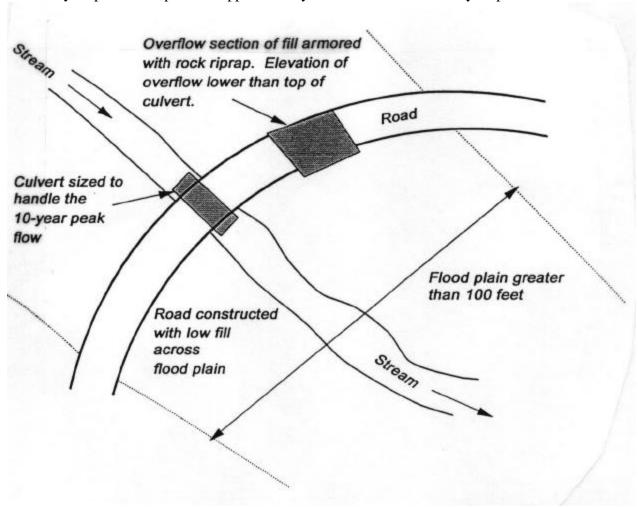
Features for the optional design of constructing a road with low fills and smaller culvert or bridge. (Adapted from landowner reference manual)
